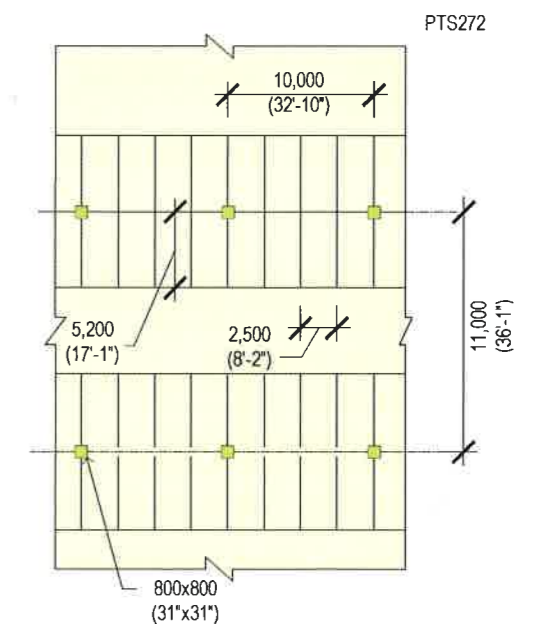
Plan of a Parking Structure in Croatia (Courtesy BBR, Croatia)
